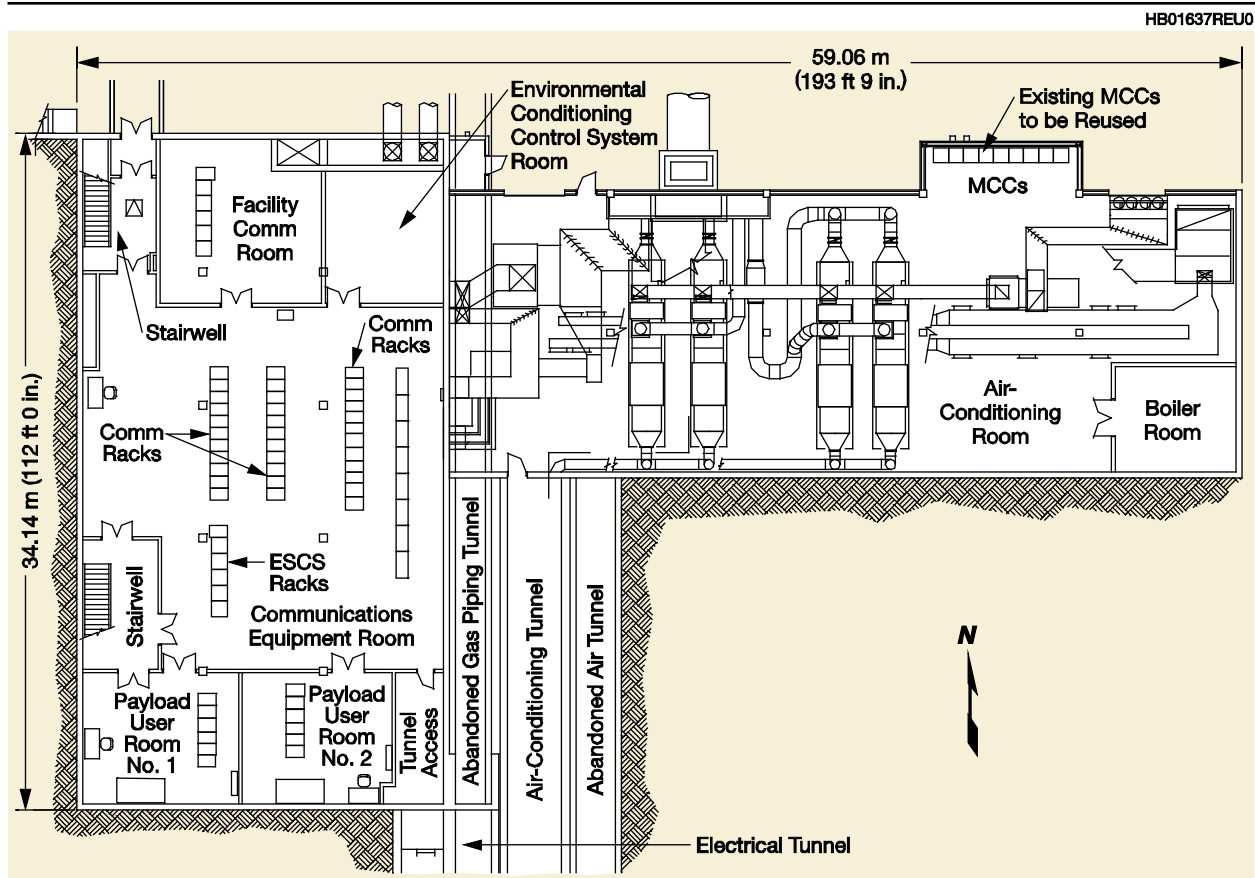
Support Equipment Building (SEB) (Building 395) First Floor Plan
